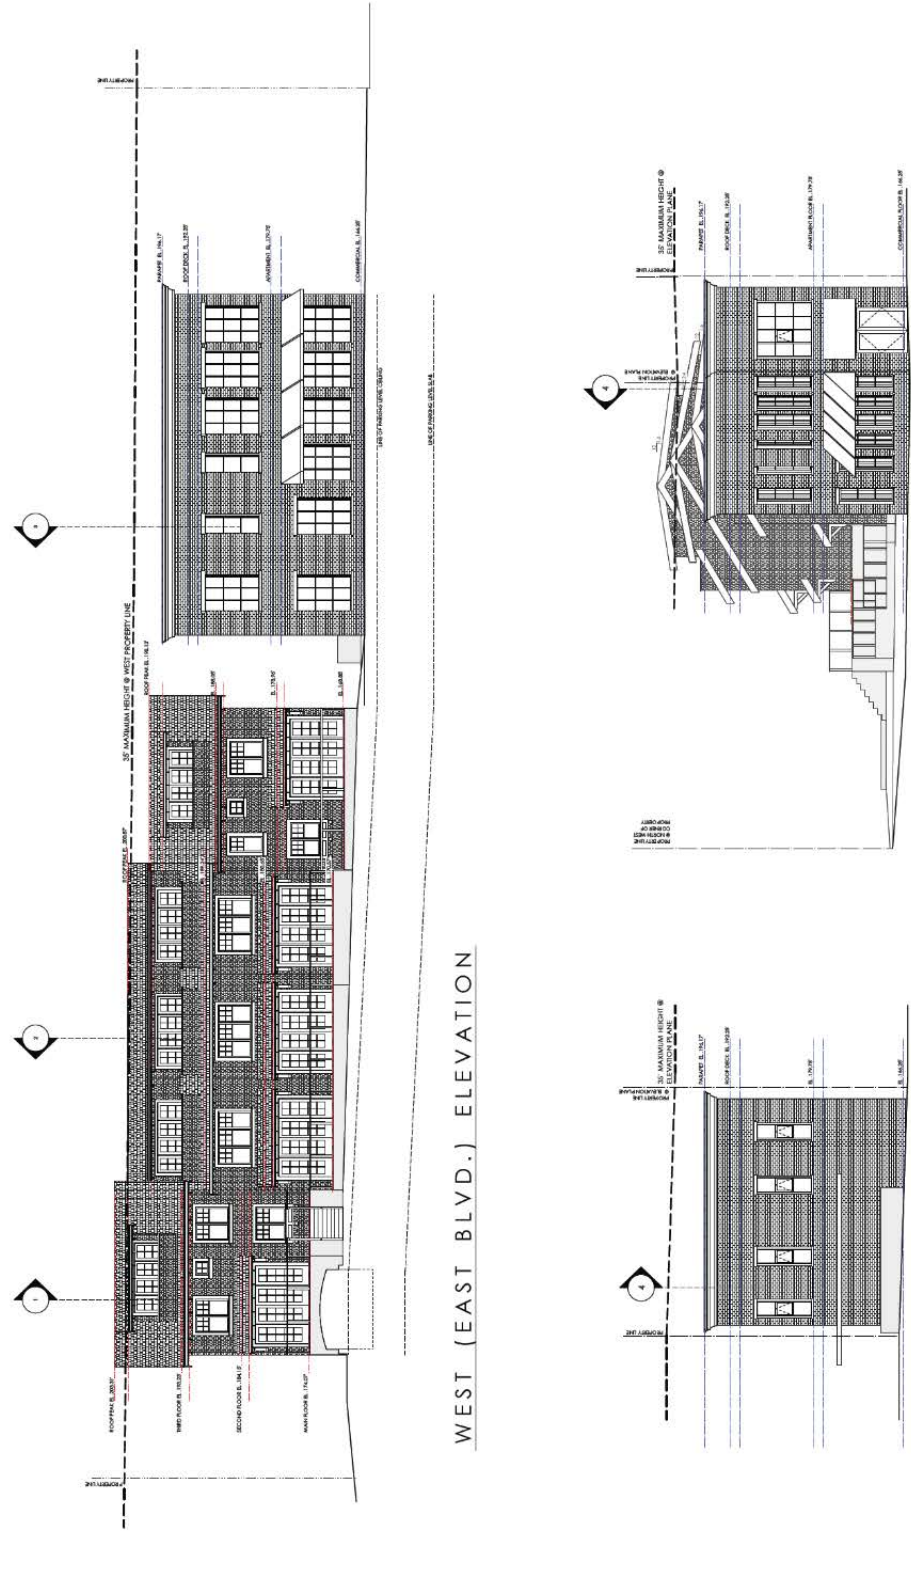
Elevations (East Boulevard and North and South Elevations of the Commercial Building)
